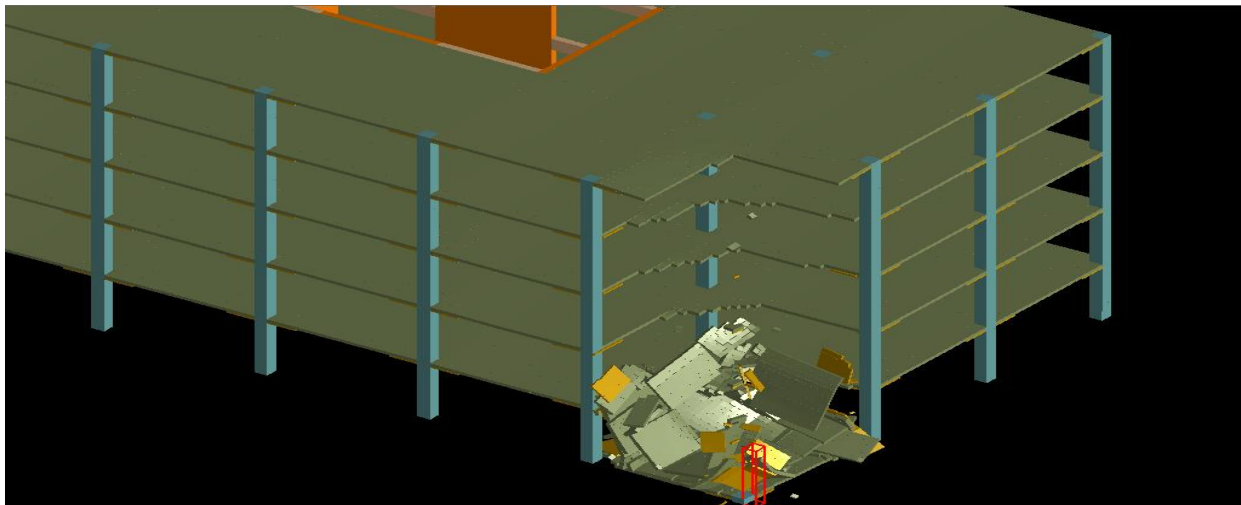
Corner column removed in a 5-storey shear wall building with flat slab system. (at 5.0 sec of the analysis)
